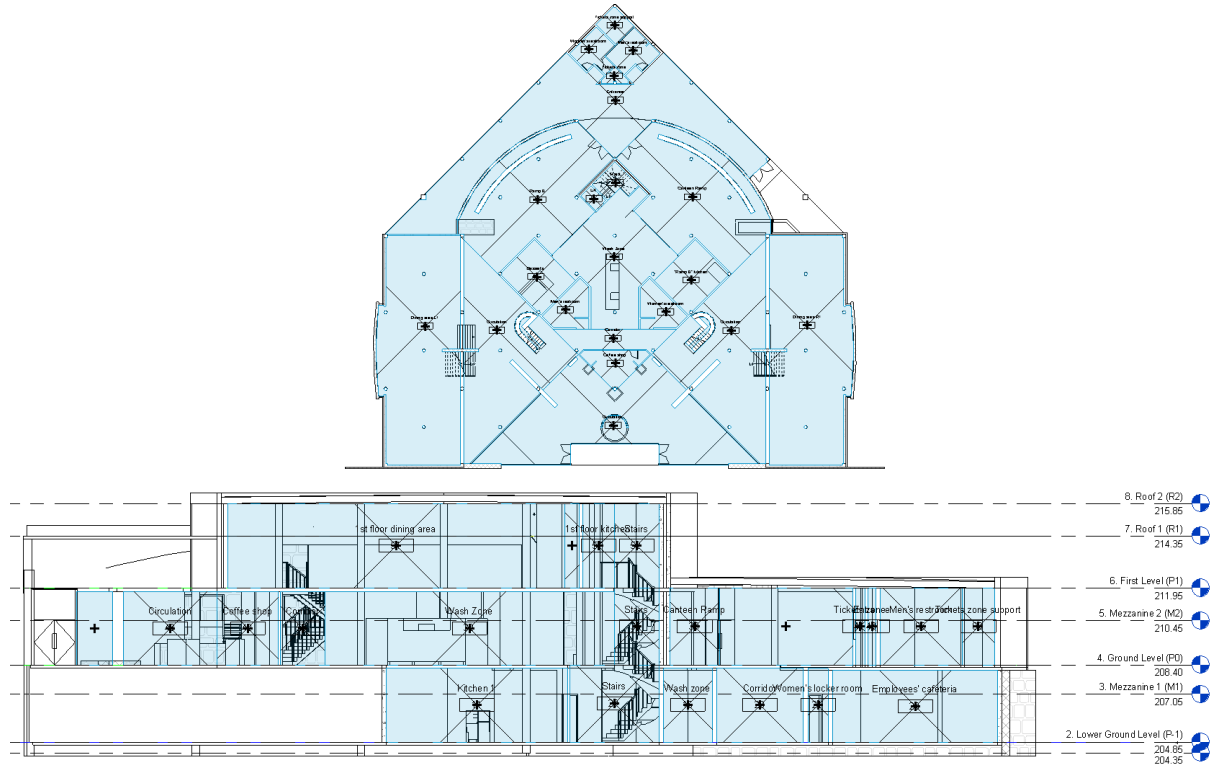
Spaces' allocation in the P0 floor plan and in a section of the building
